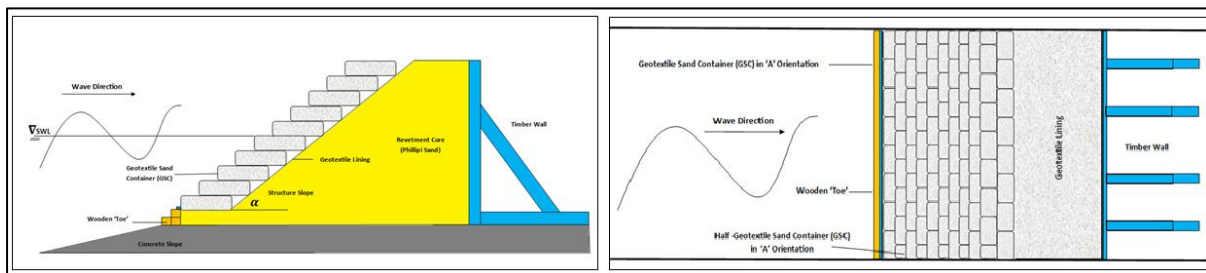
Schematic Cross-section (Left) and Plan View (Right) of GSC Revetment for Test Series 1
